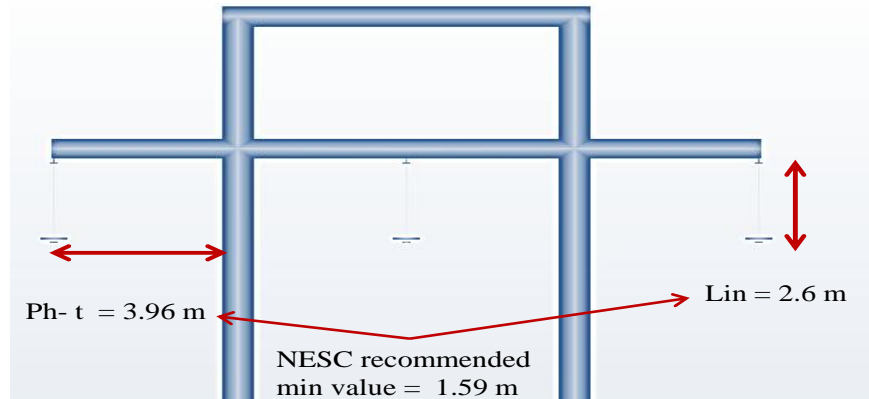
Clearances in a typical 362 kV H bridge tower
